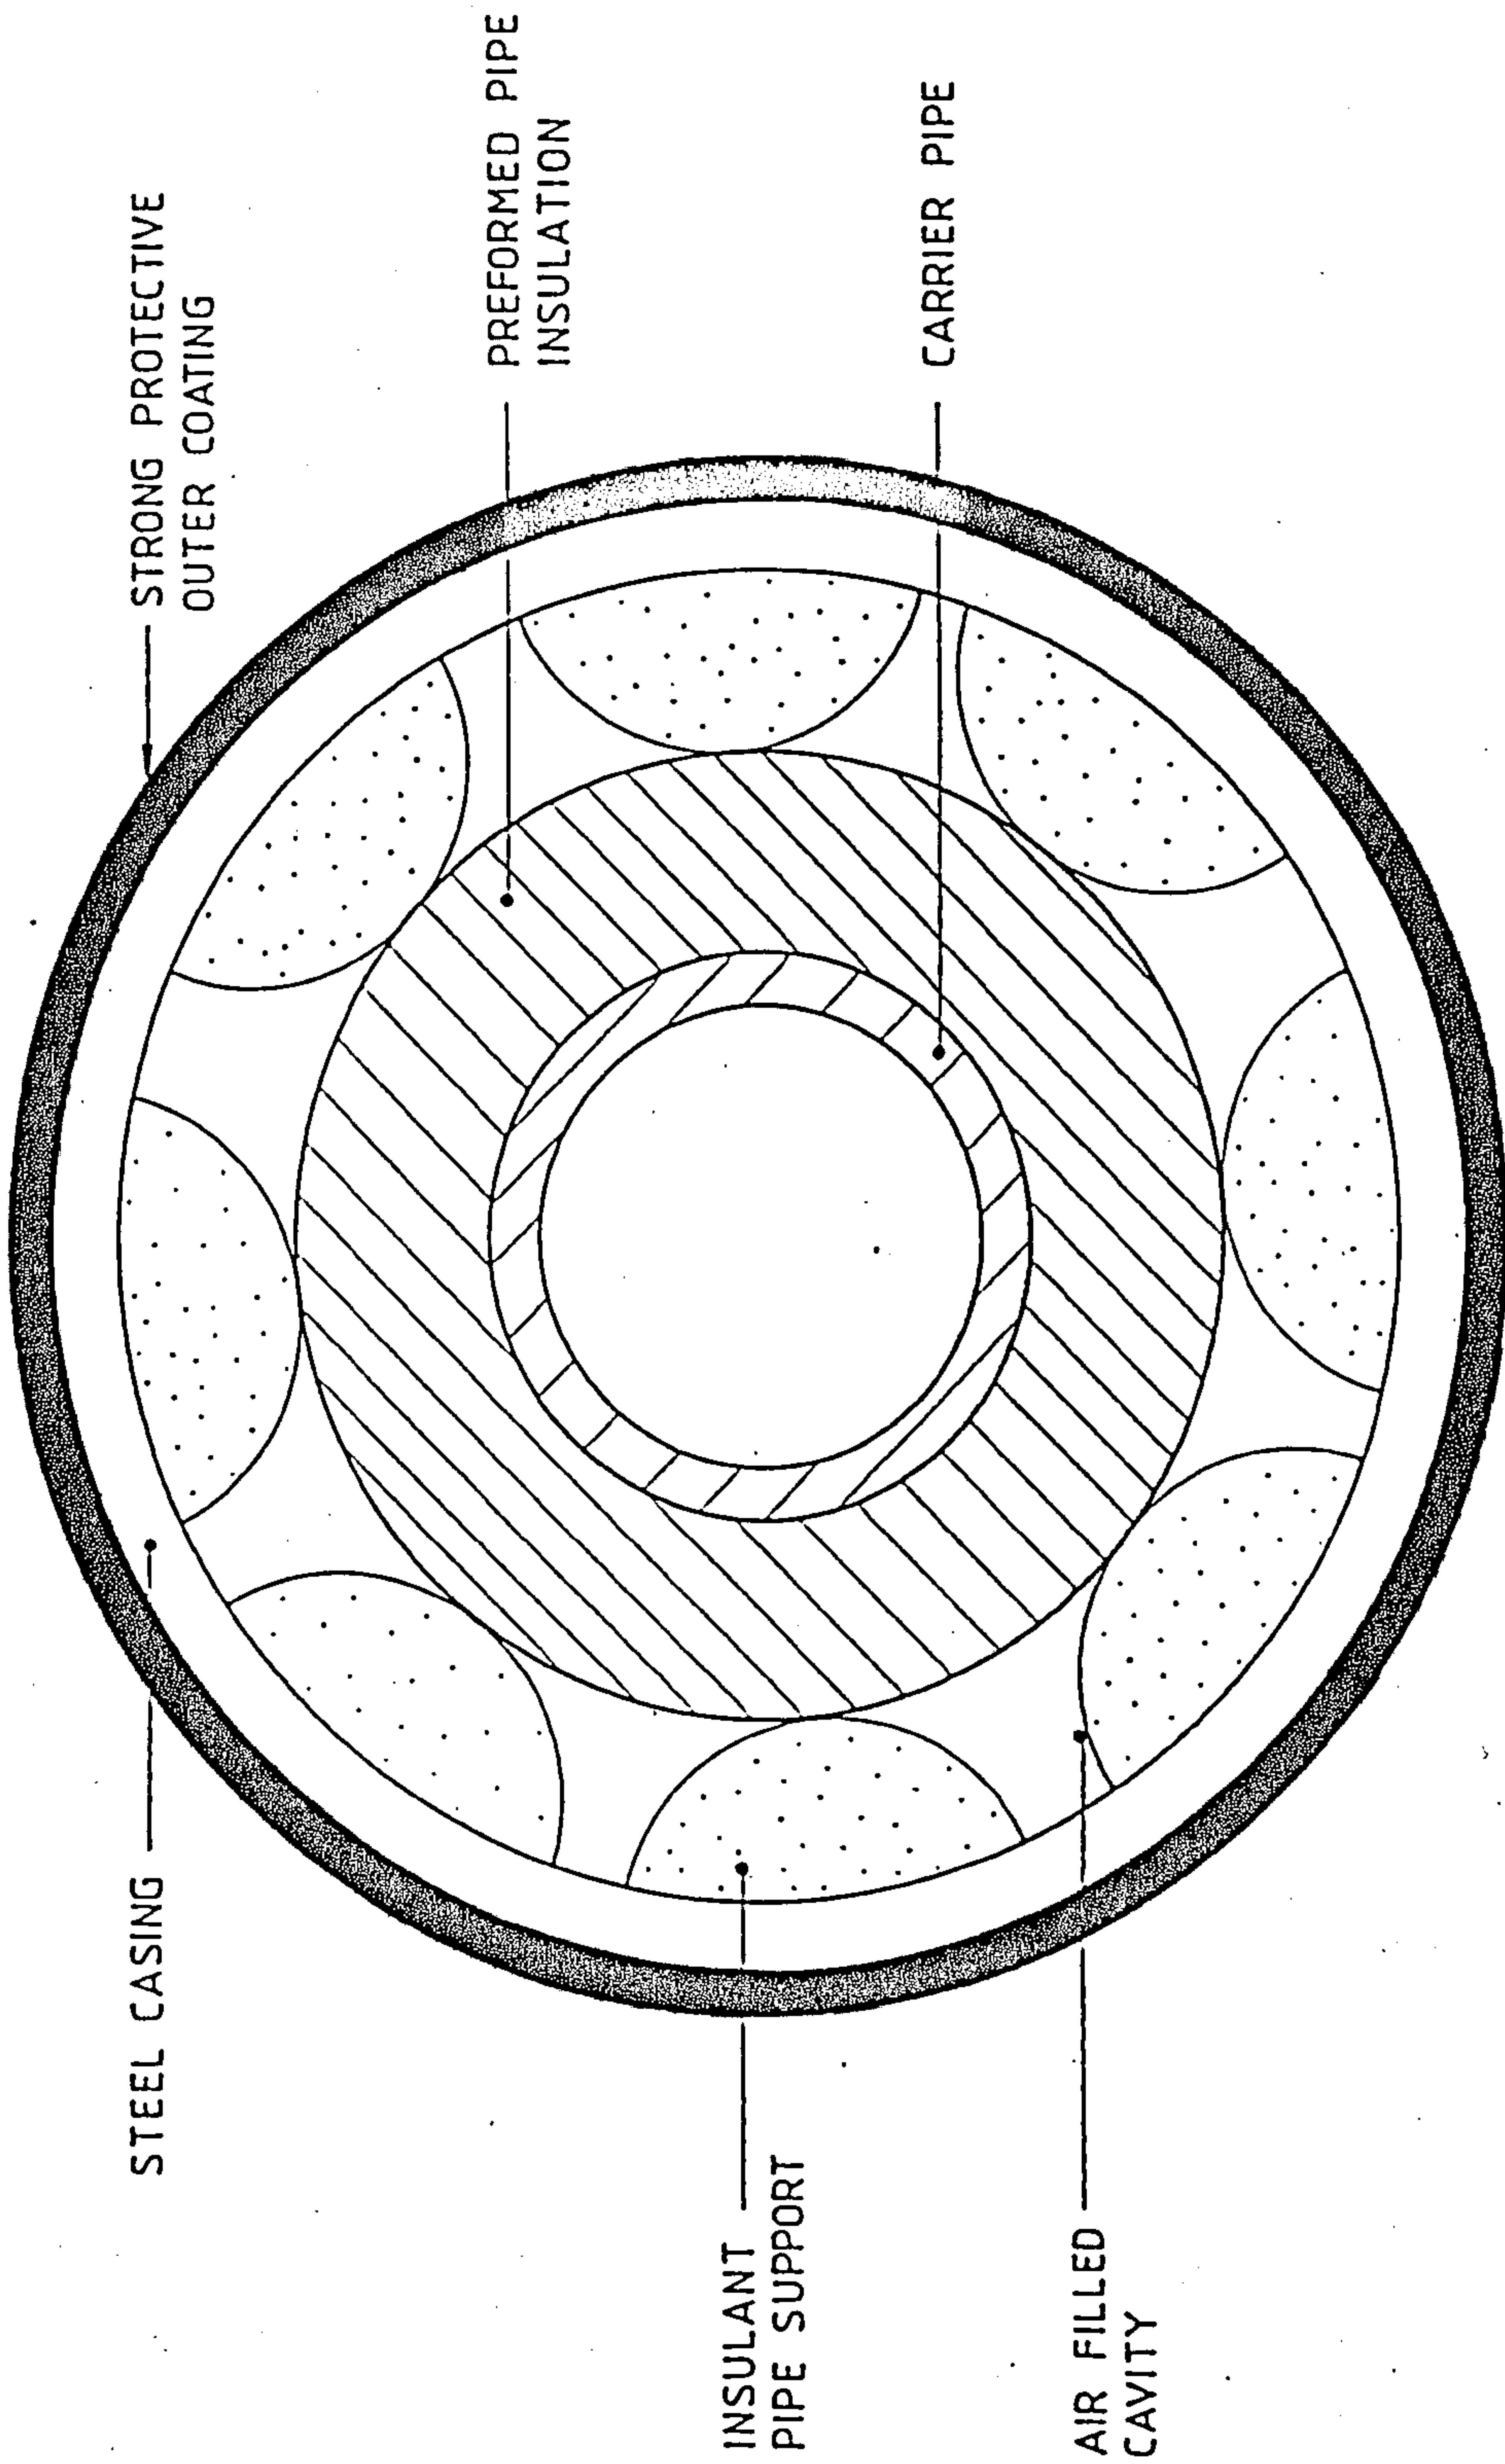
Cross-section through a prefabricated pipeline with drainage channels and dryable interlinking air-filled cavities (60).
